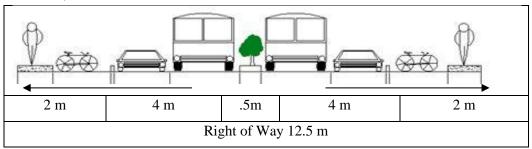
2: Typical Cross Section of Secondary Road Tertiary Road
